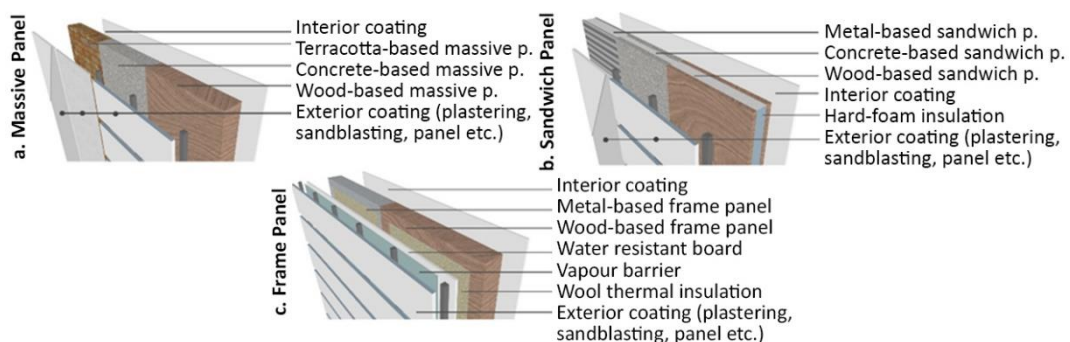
Prefabricated facade panel designing concepts massive, sandwich and frame
